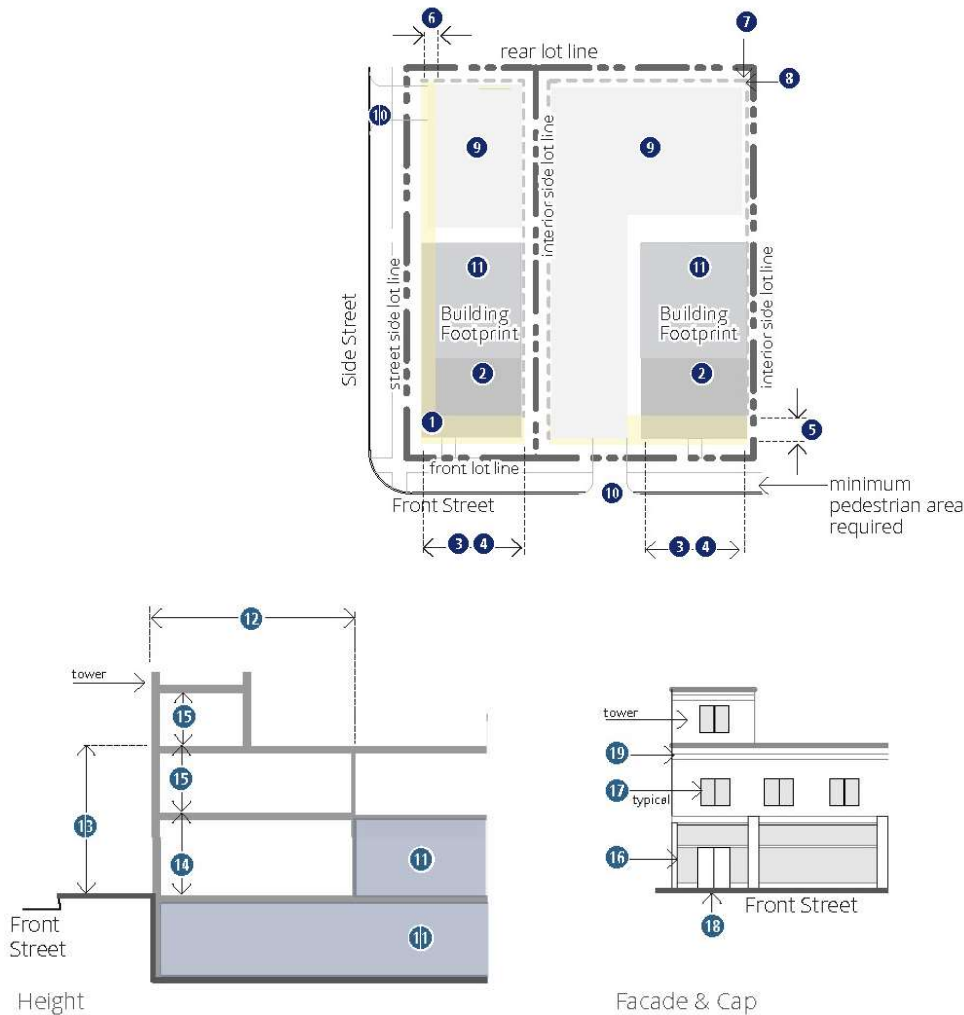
(4). NMU district diagrammatic plans and elevations.
